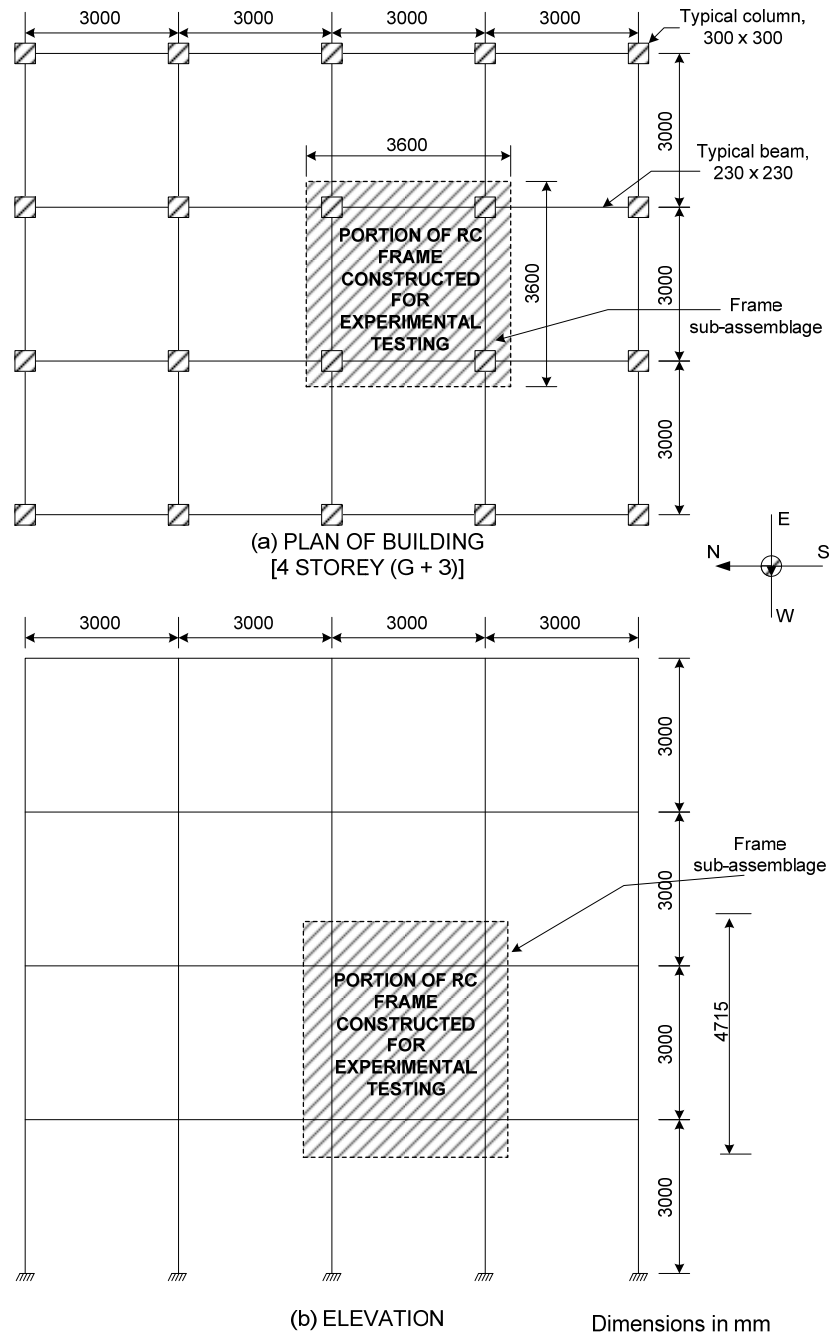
G+3 RC Frame Structure (a) In plan (b) In Elevation.
